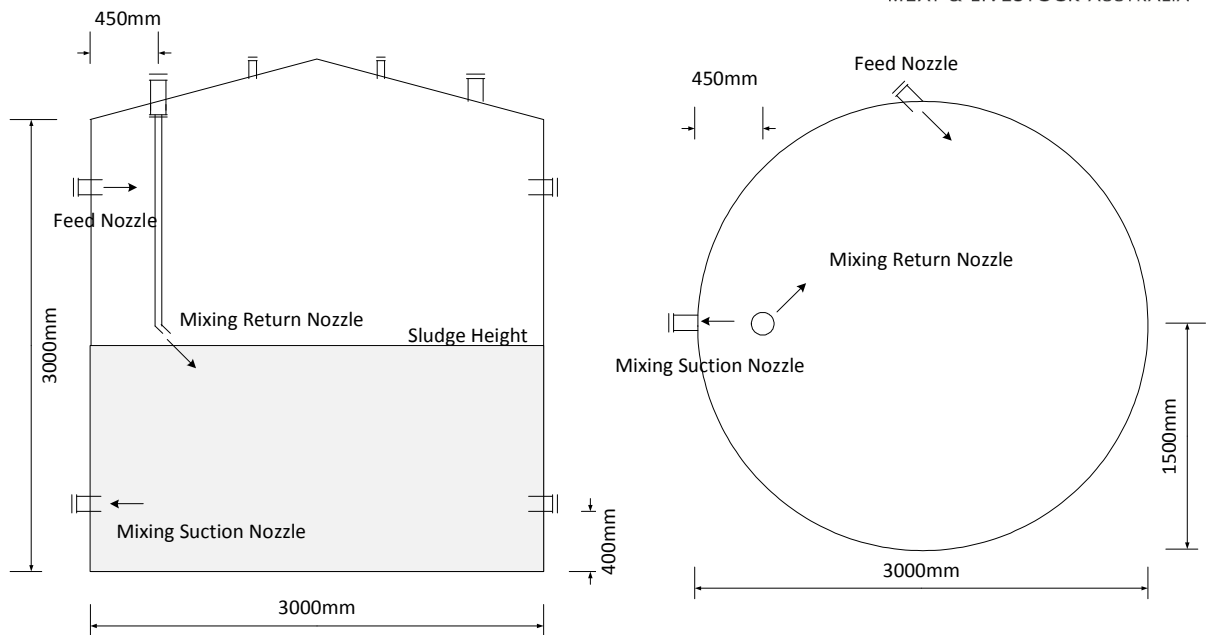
Pre-treatment tank: dimensions, location of feed points, withdrawal points and mixing nozzles
